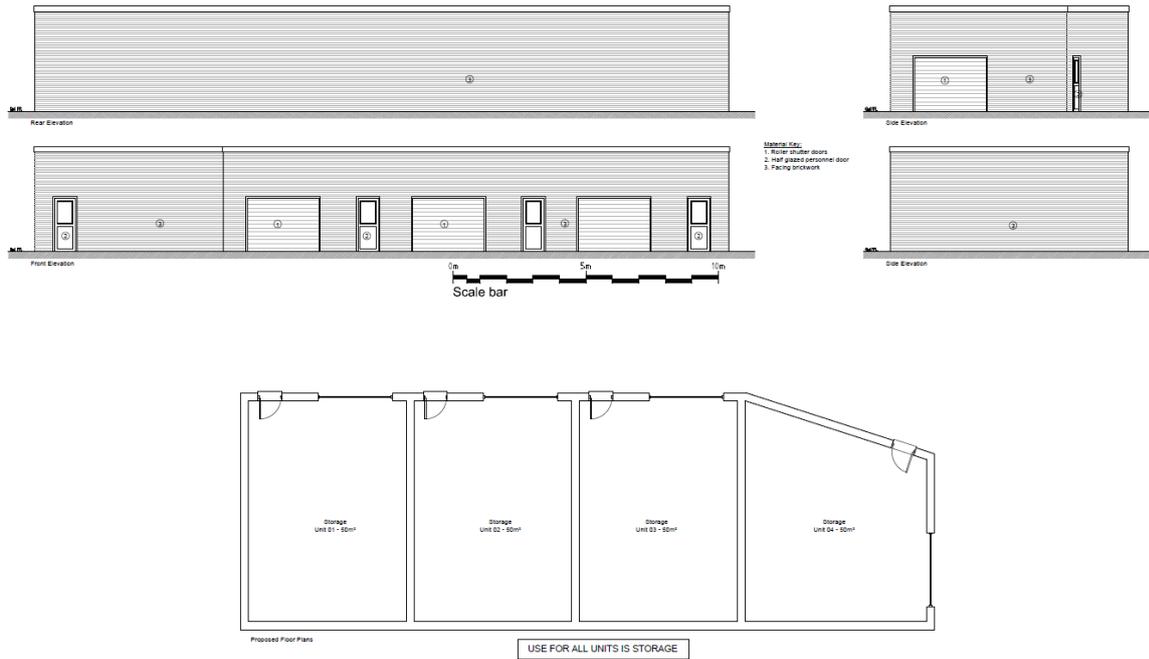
Proposed Outbuilding Elevations and Floor Plans
